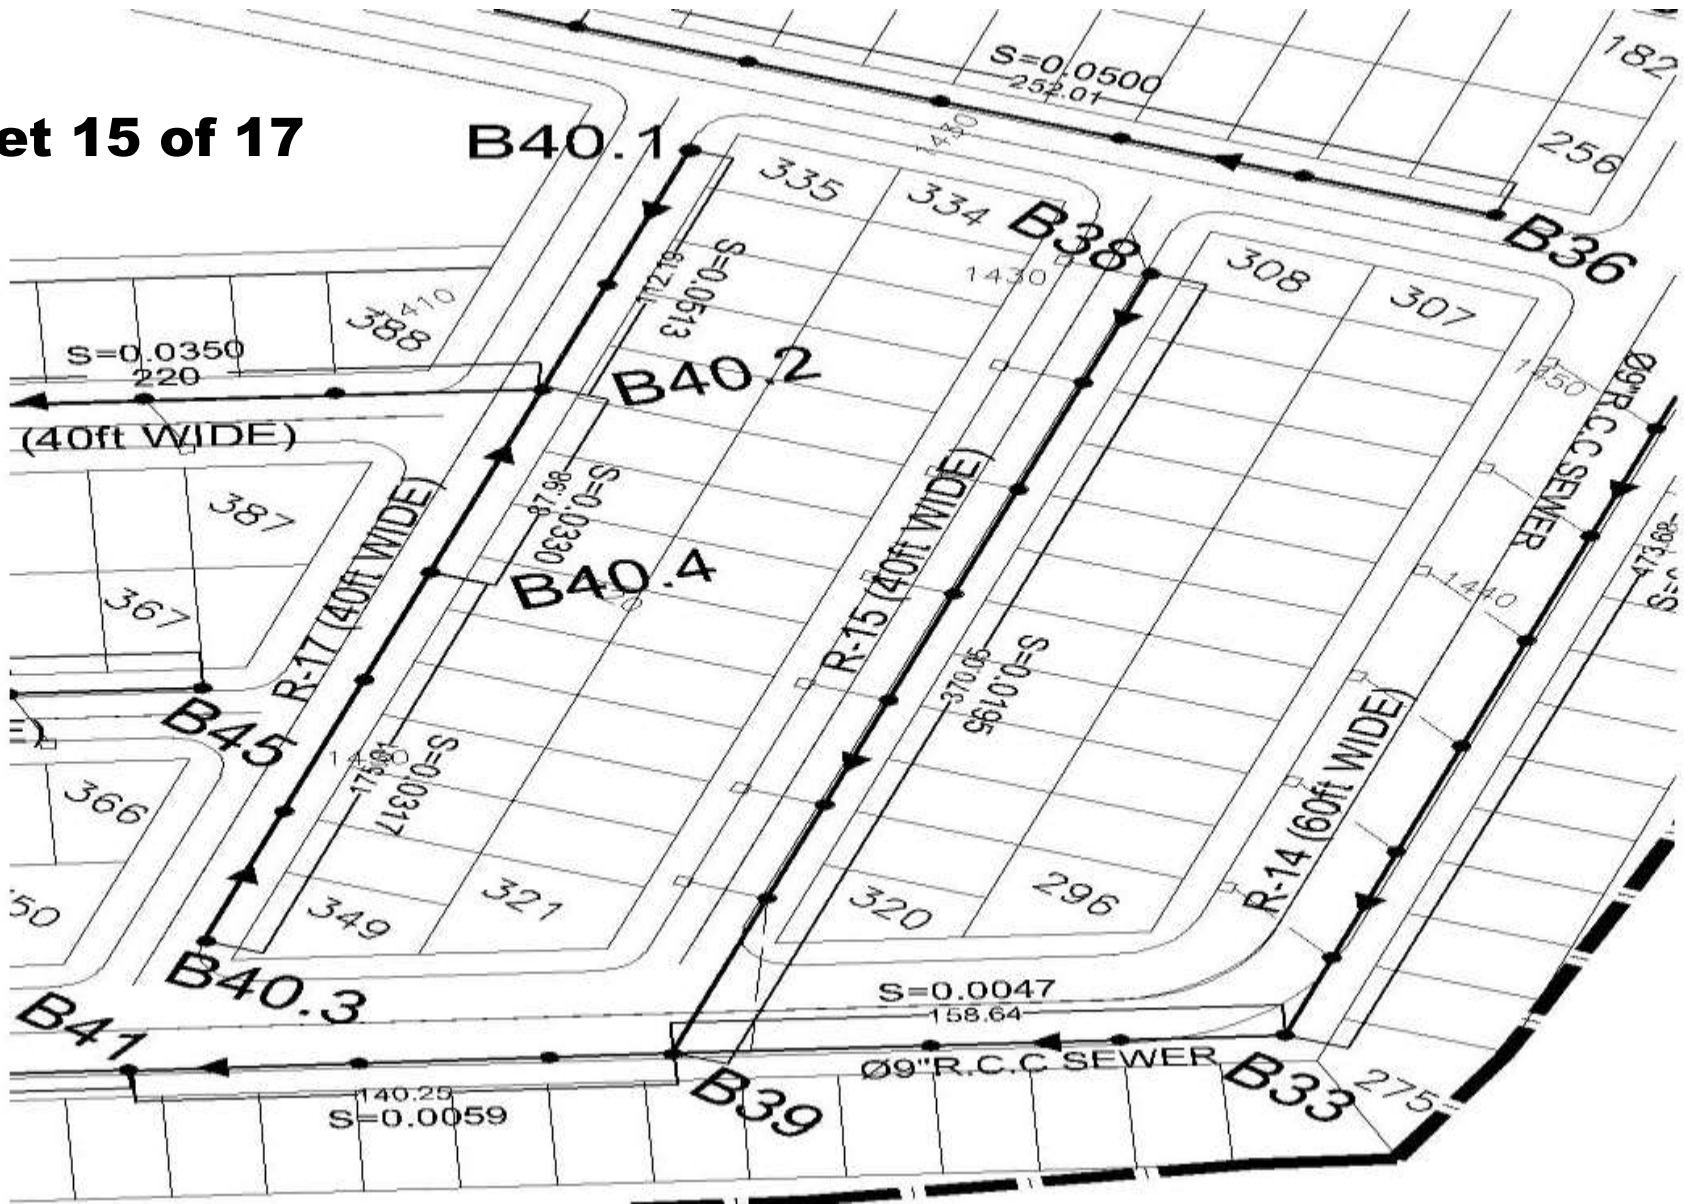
Sewer layout plan of Zone-2 at R/S of R-14
